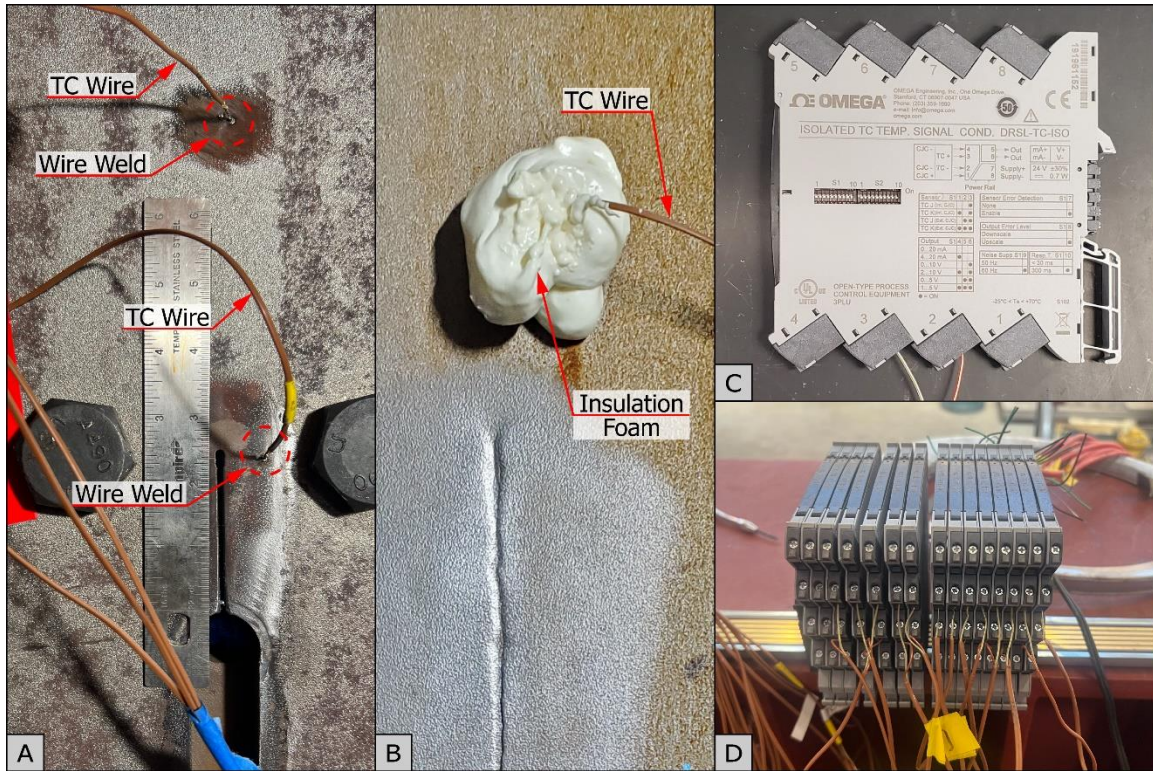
Instrumentation for temperature monitoring: (A) TC wires welded to the bottom flange of specimen B2; (B) TC wire tip insulated with foam; (C) Omega DRSL TC ISO Signal conditioner; and (D) stack of signal conditioners wired to the power supply and DAQ.
